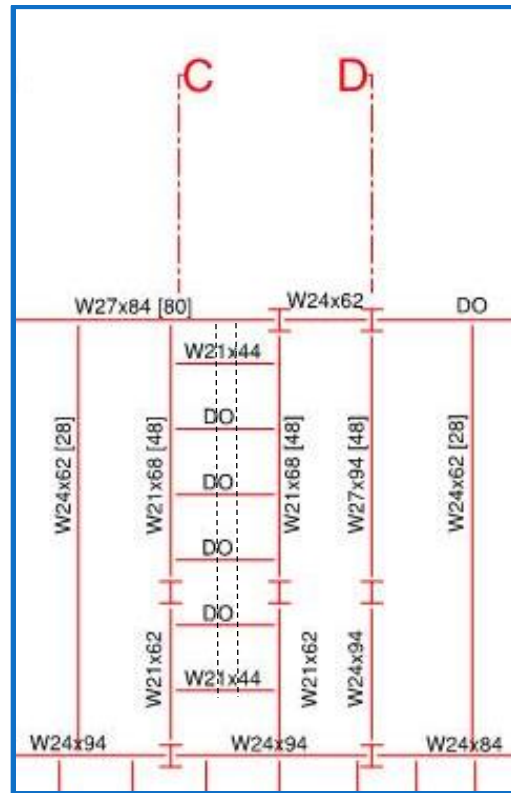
Enlarged View of 2nd Floor Framing at Garage Entrance
